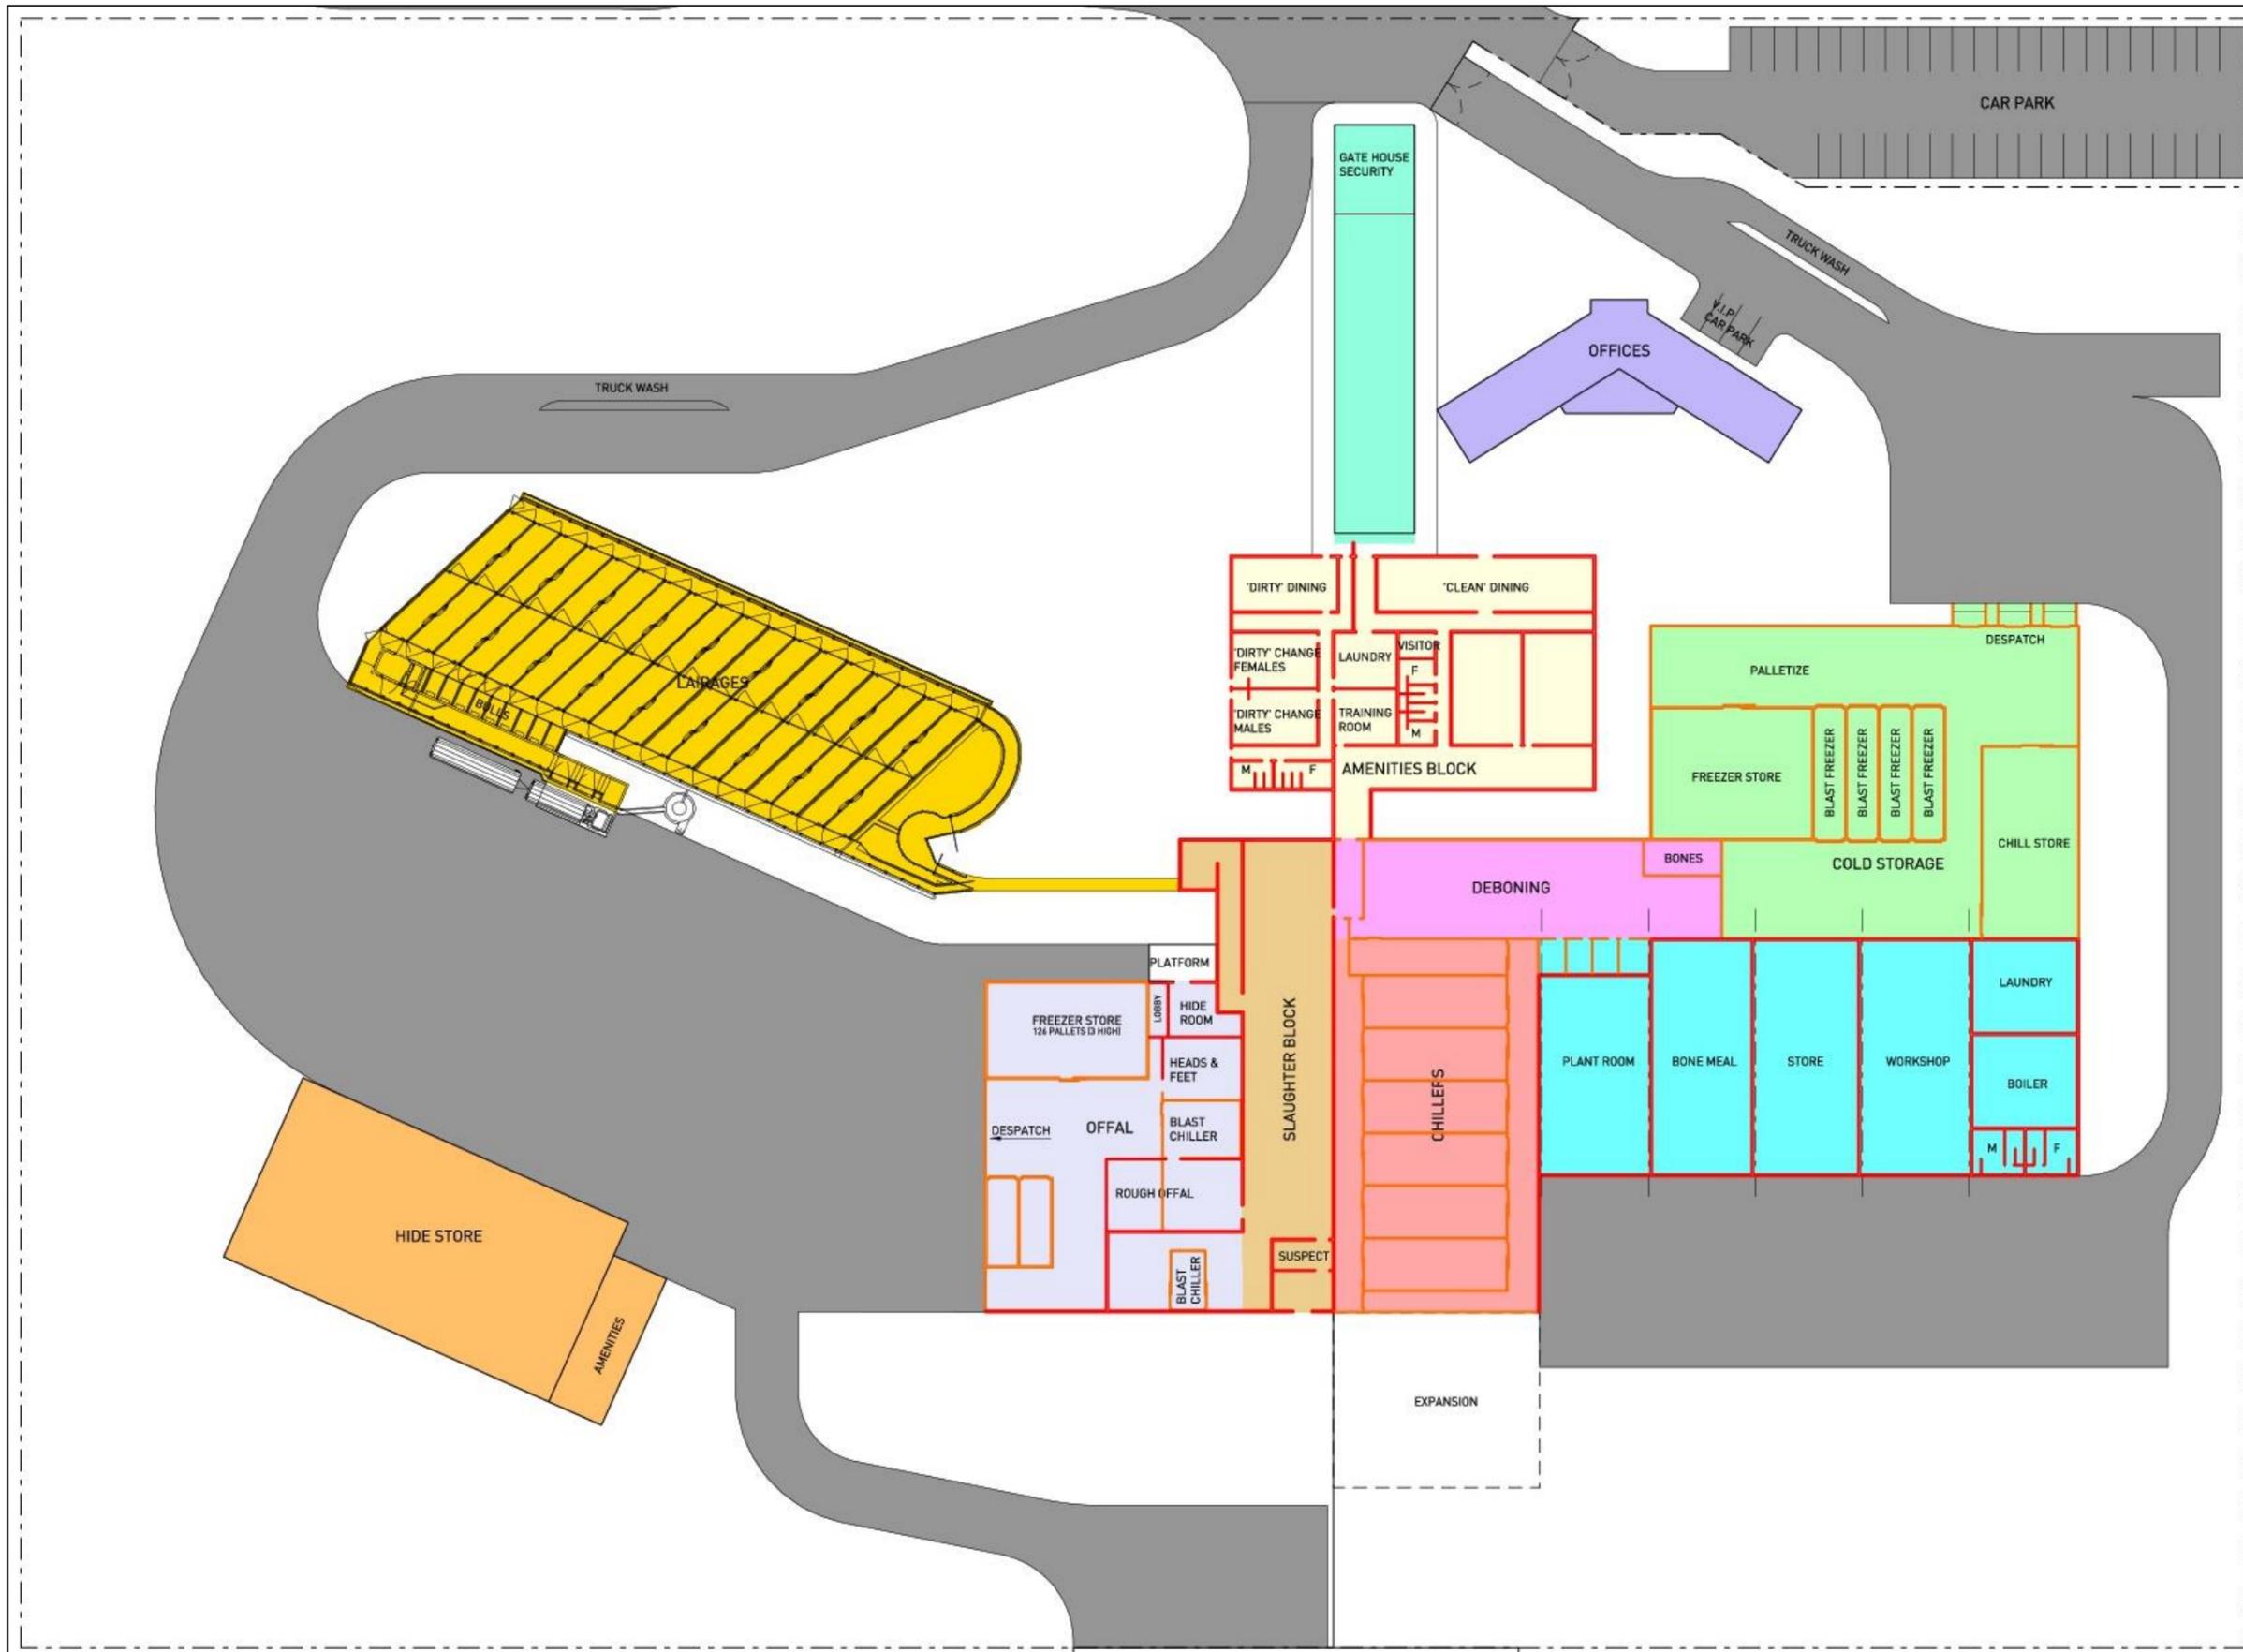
Layout plan for the proposed abattoir on farm portion 1865/2 in Berlin, Eastern Cape.
